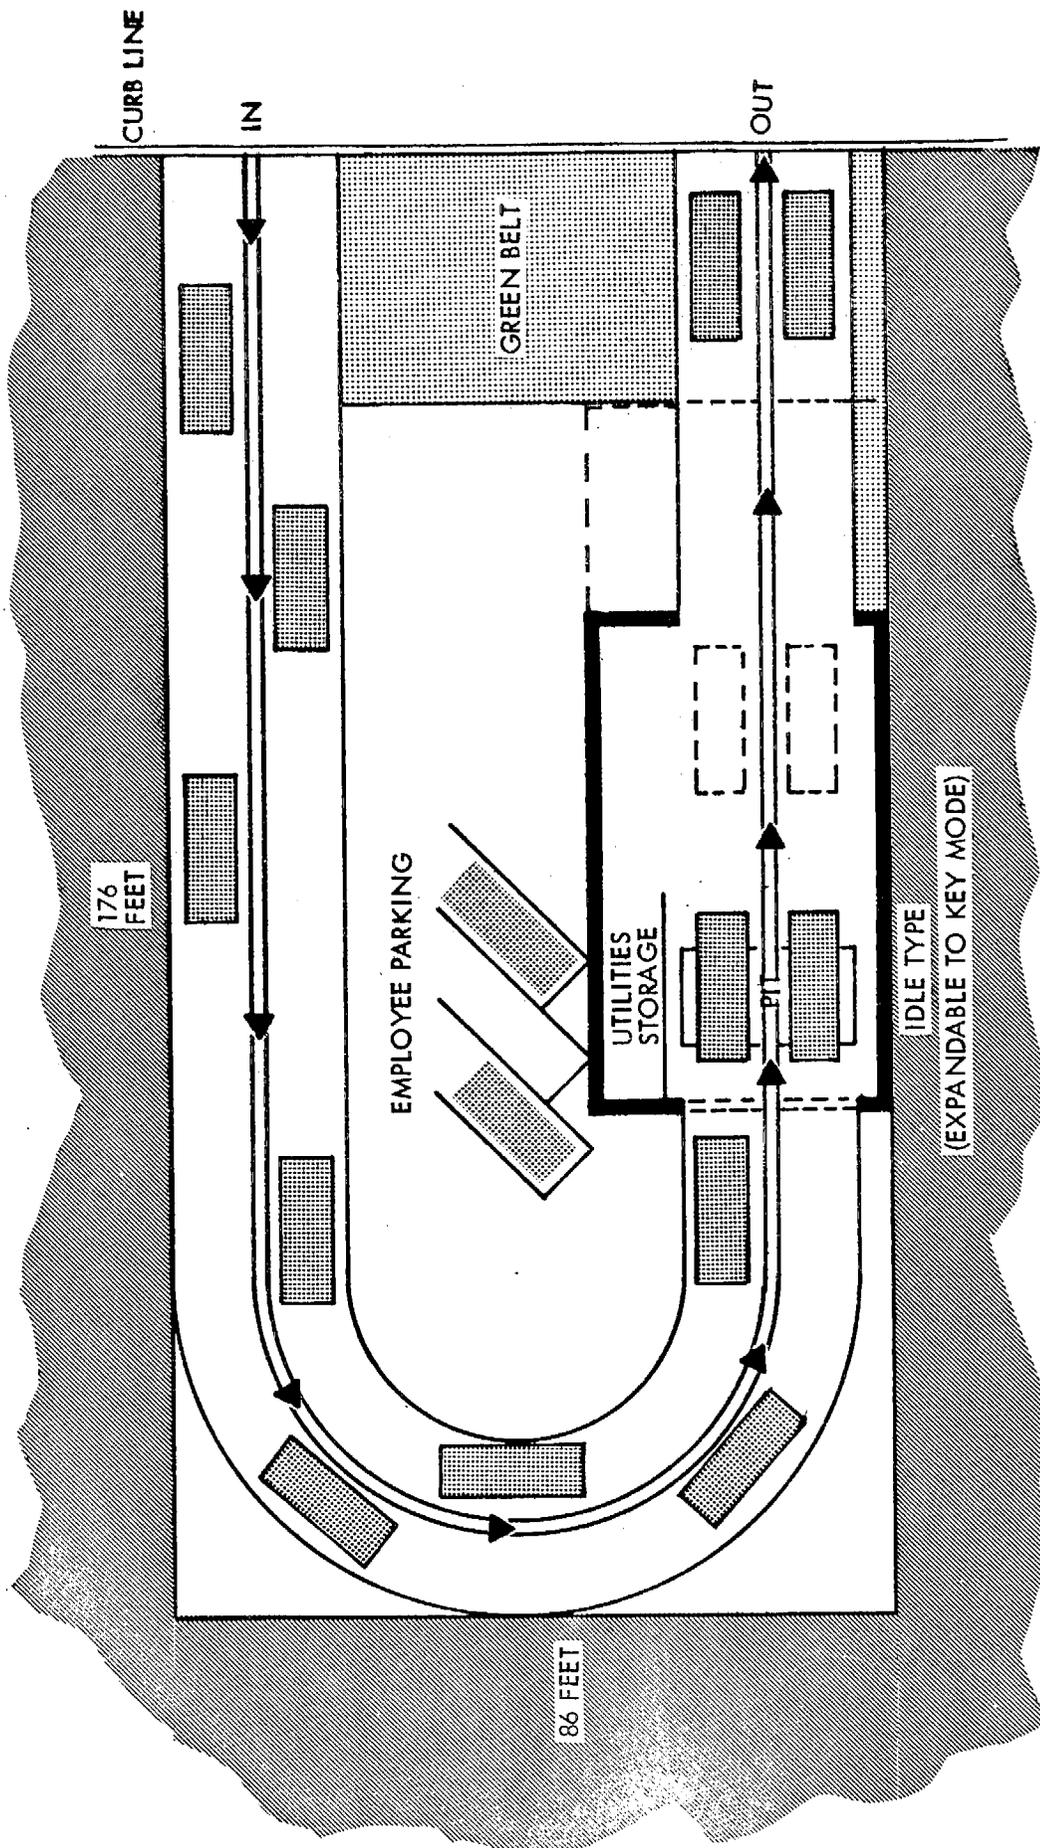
TWO-LANE STATION FLOOR PLANS (Sheet 3 of 3)
